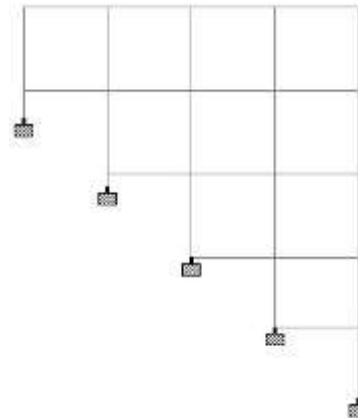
ELEVATION OF A INCLINED GROUND (40°)
